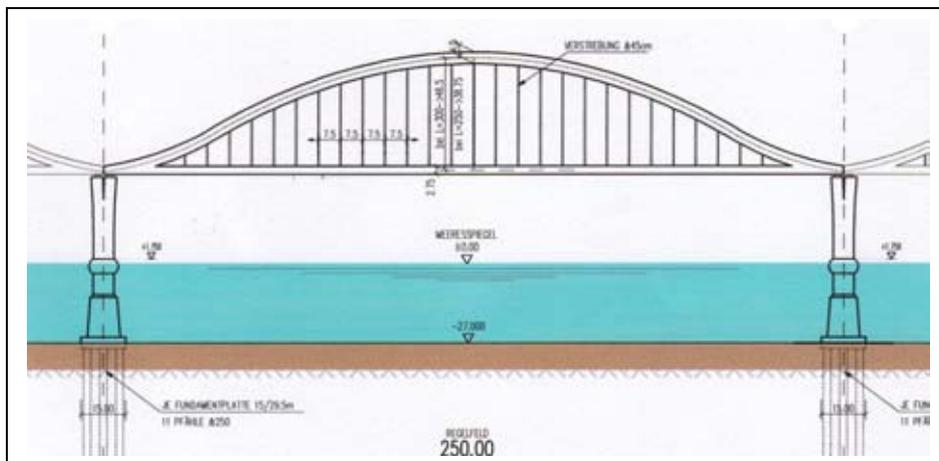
Typical „Langer girder“ steel arch span of 250.0 m.
